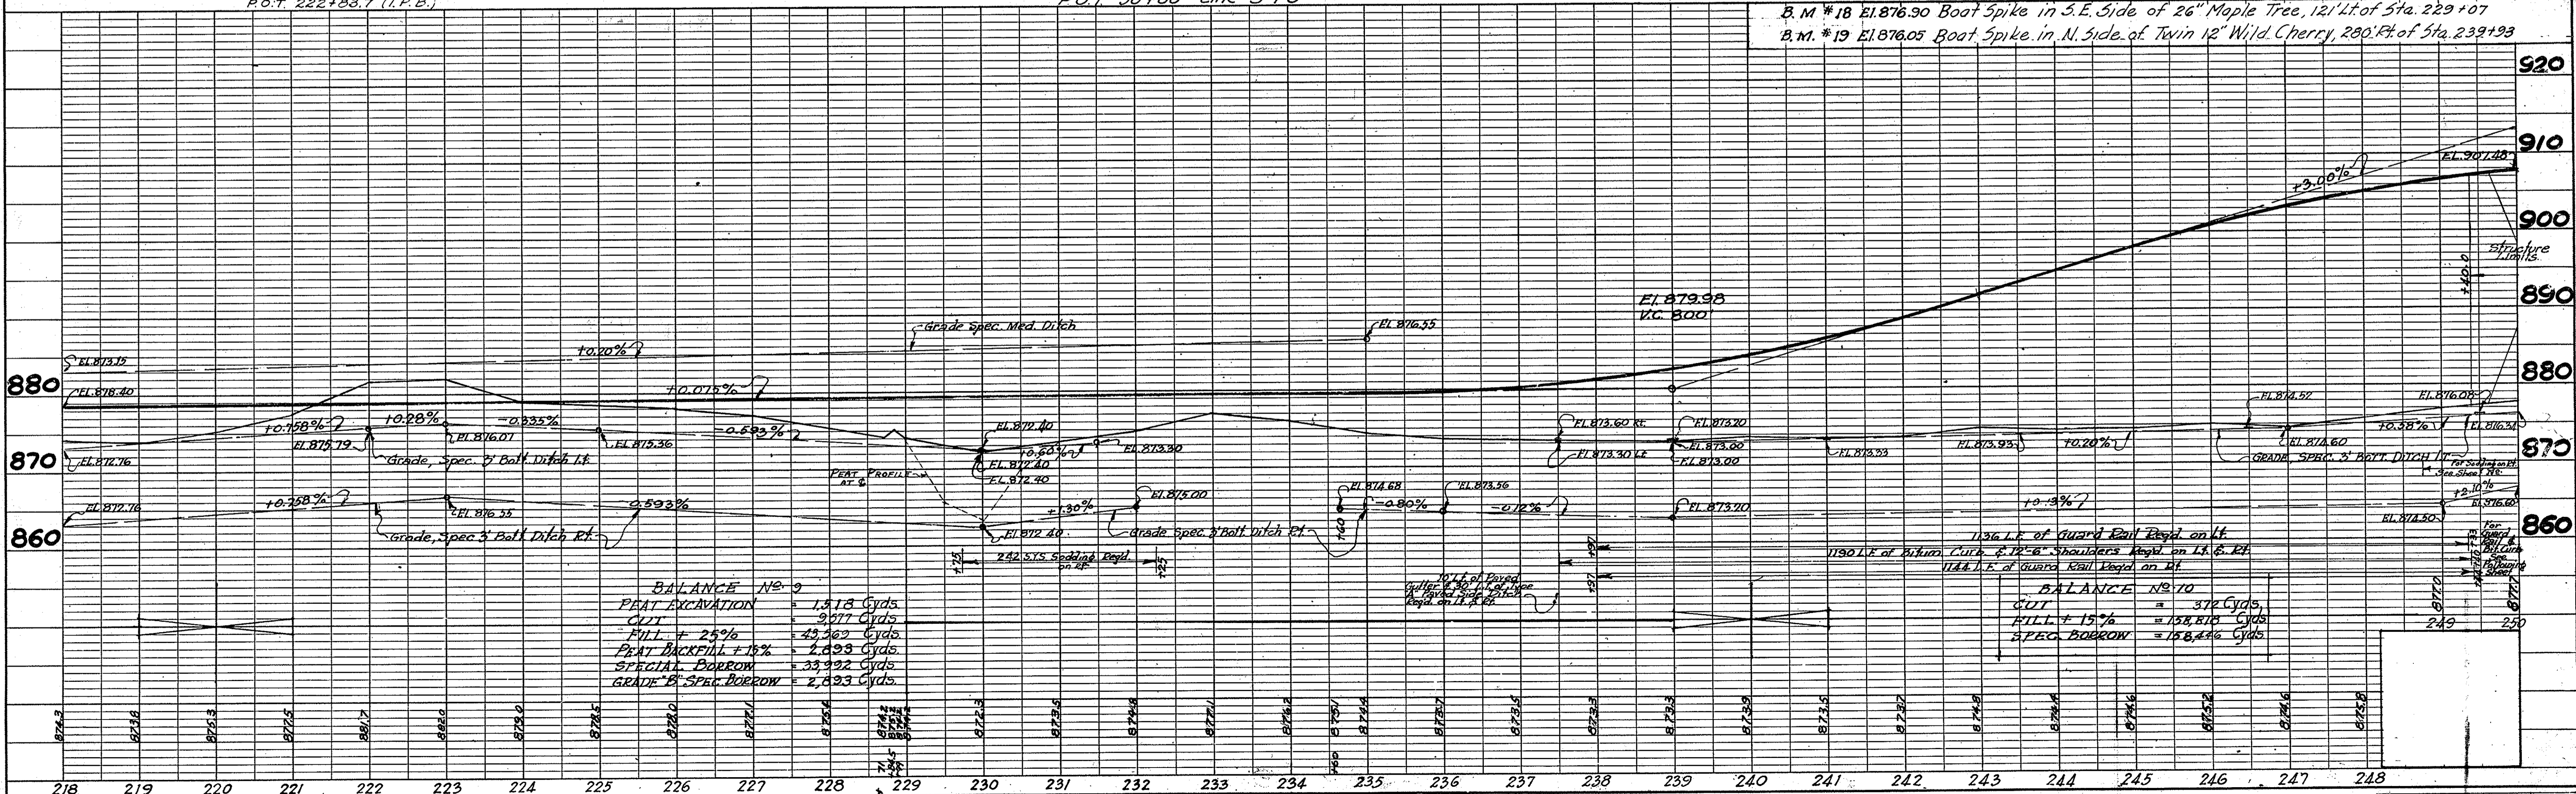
PLAN - PROFILE O.P.R. & R.E. STANDARD
